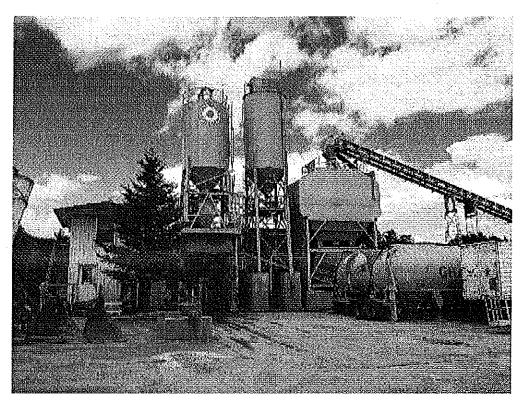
(7/23/14) : Champion Concrete batch plant, entire facility.
